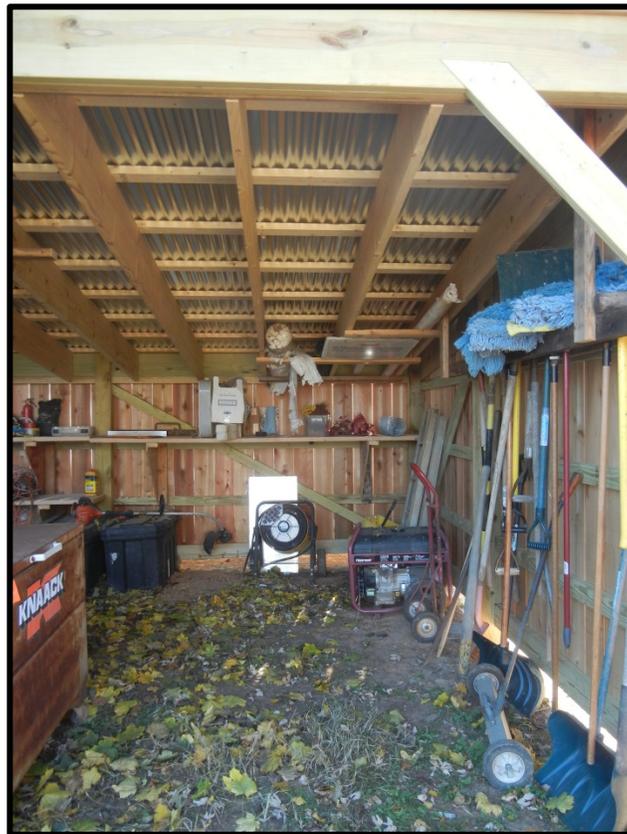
The interior of the newly constructed pole shed located at the rear of the property at 11 Russell Ave., facing southeast (November 2016).
